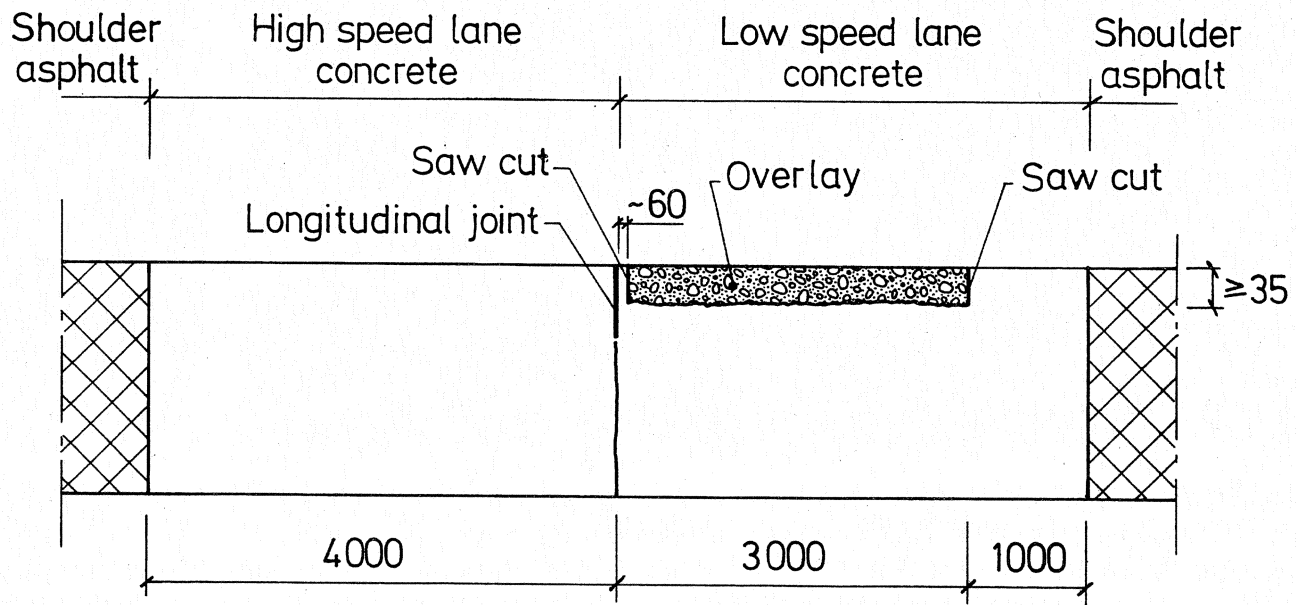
Repair of concrete road. (The scale in the thickness direction is exaggerated).
